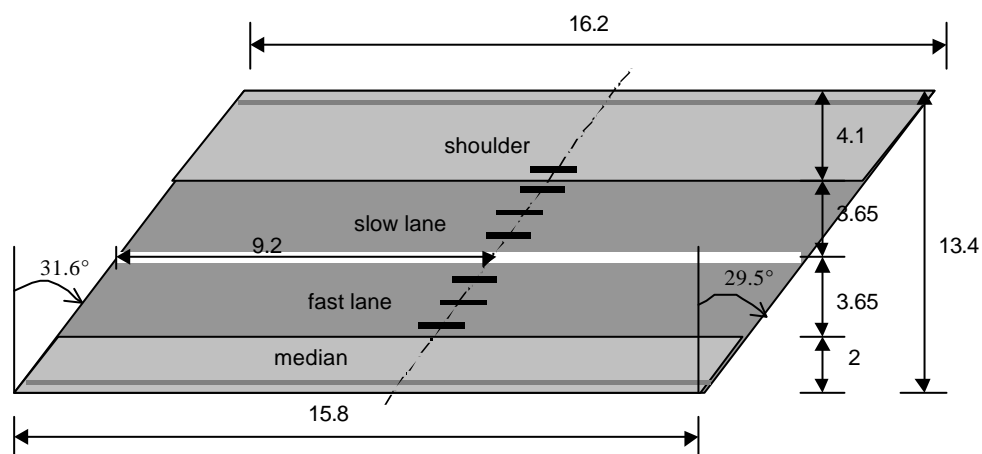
Plan view of Barry Bridge (South-bound carriageway)
